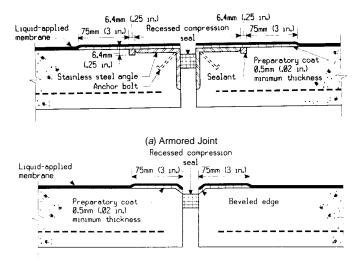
Typical Expansion Joint (see 10.4.4.3 and 14.5.6)
